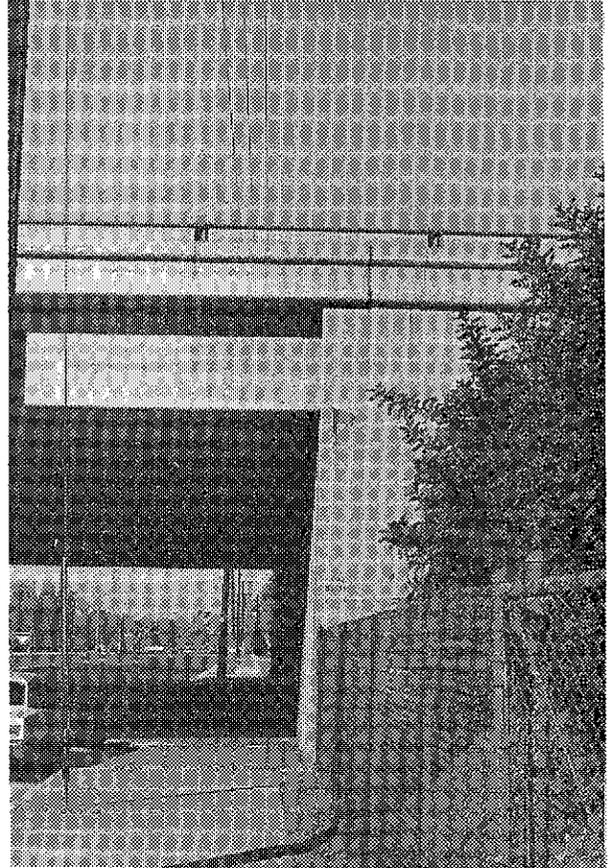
Typical curb crack and displacement caused by forces from curtain wall movement. Note cracks in sidewalk adjacent to curtain wall.
